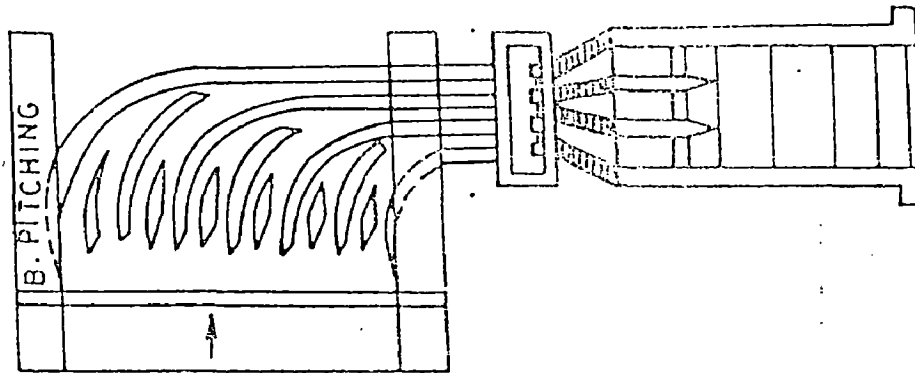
TYPICAL LAYOUT OF TUNNEL EXTRACTOR
